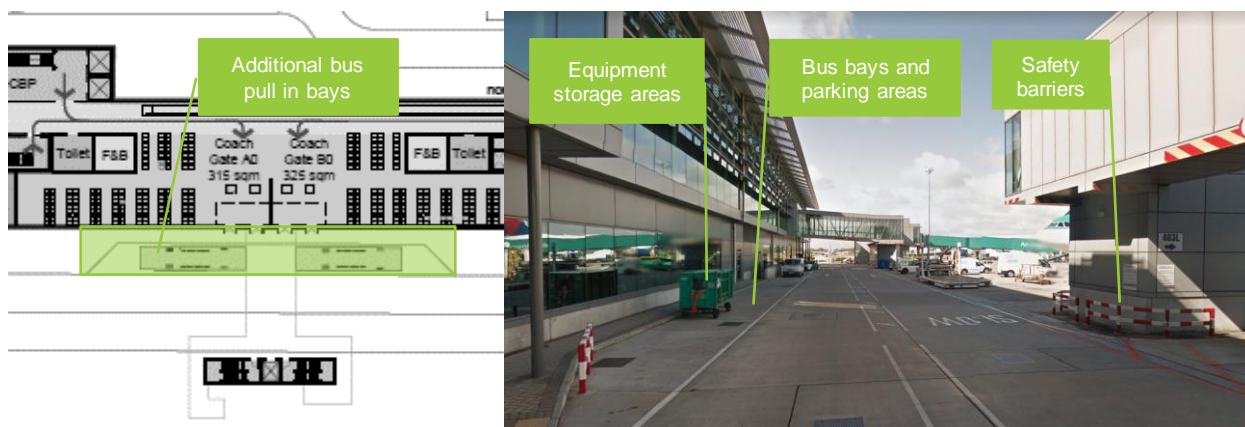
Pier 5 front road, additional scope & Pier 4 road
